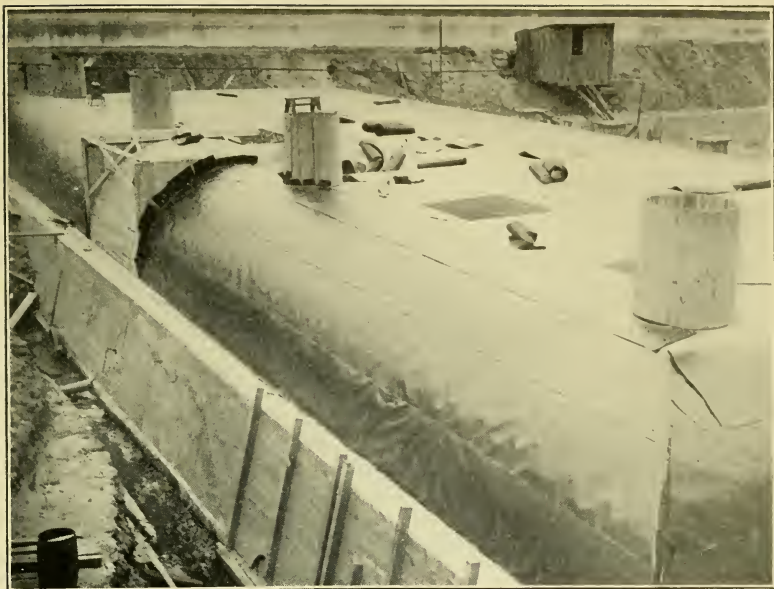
View of Barrel Arch and Outside Wall, Nov. 1, 1906.
